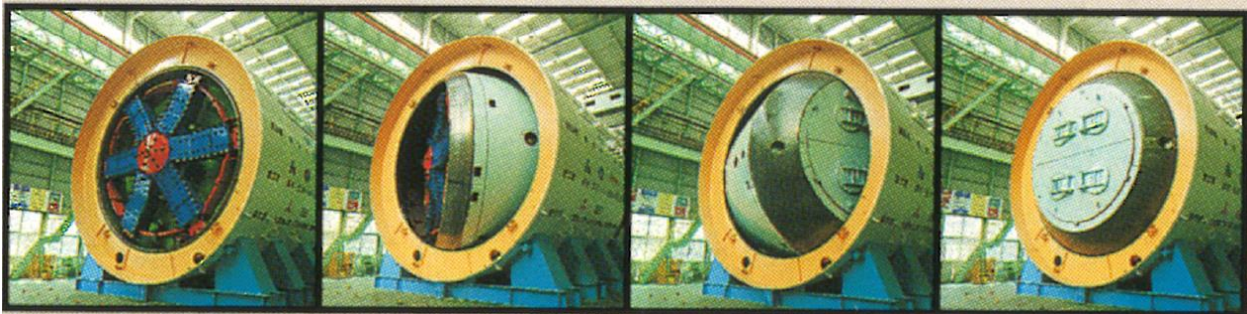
Full Pressure Cutterhead Access design. Courtesy of MHI
